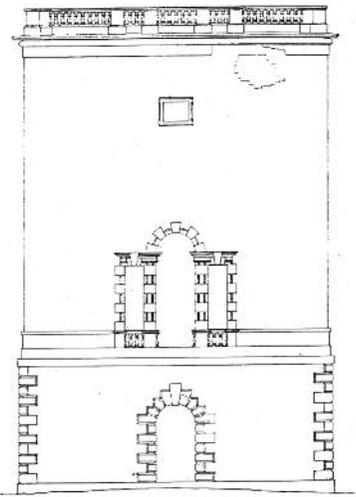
The Belvedere, north elevation, 1988. *Architecton.
